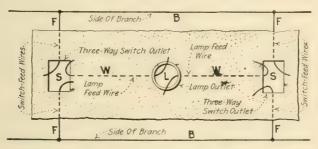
Showing conductor arrangement for Carter-connections of two-location lamp-control, employing two three-way switches, as it appears at the outlets before connection to the switches and lamps.
